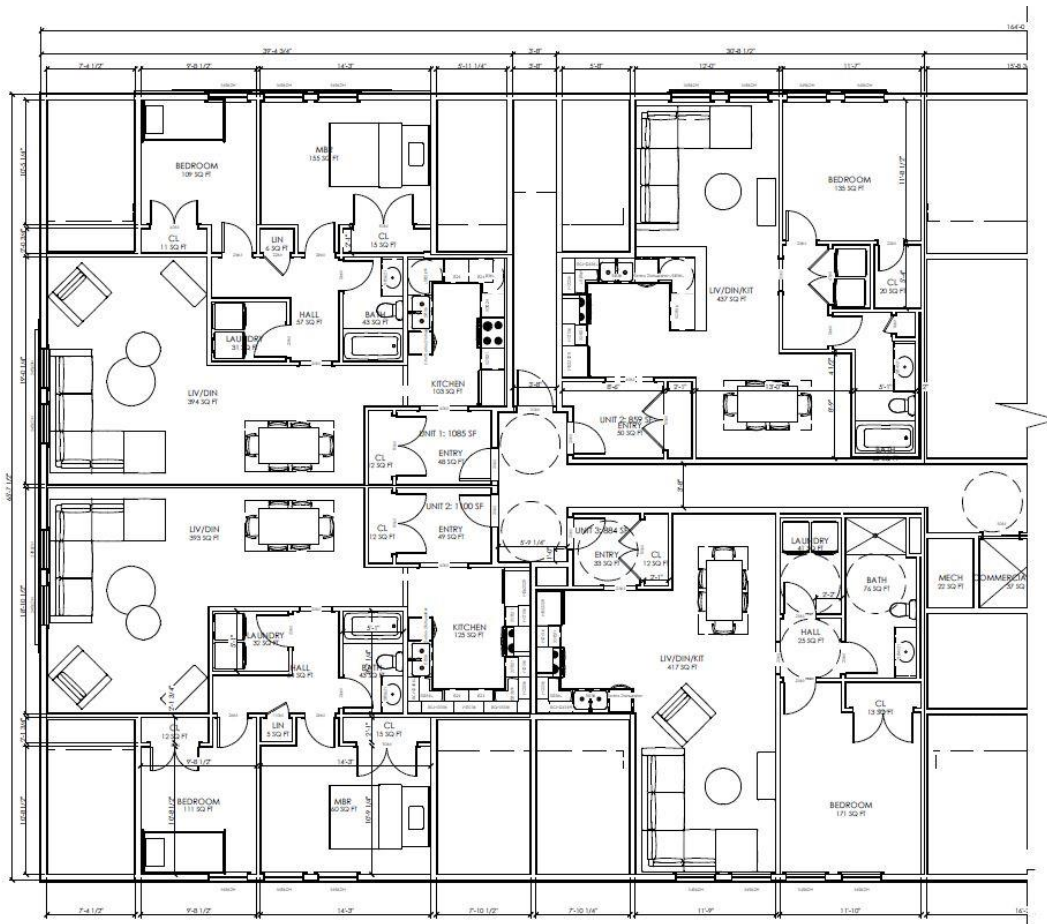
Floor Plans – 2nd Floor Accessory Dwellings (Source: Wren Design Studios)
